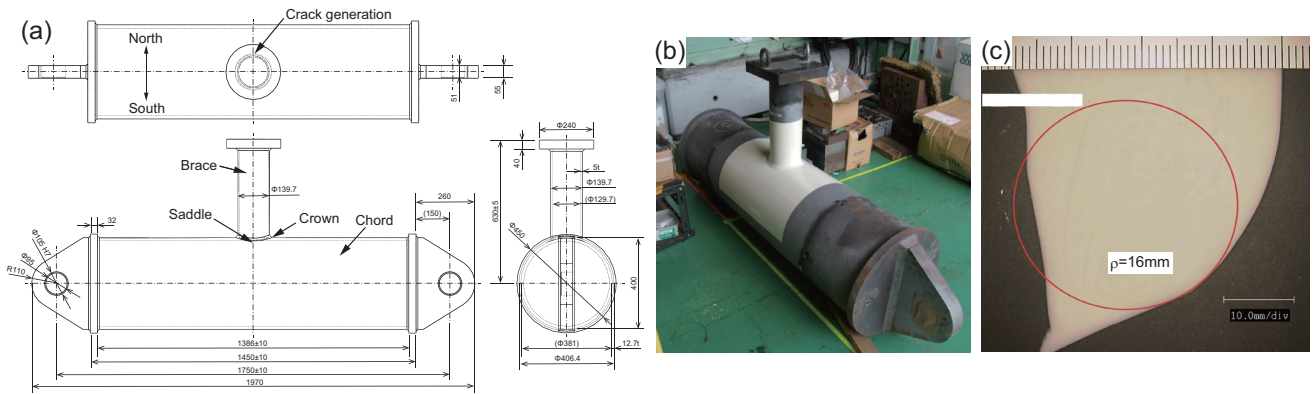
T-shaped tubular joint specimen: a Drawing, b Overall view of the joint, c Curvature radius at north saddle cast by an impression material
